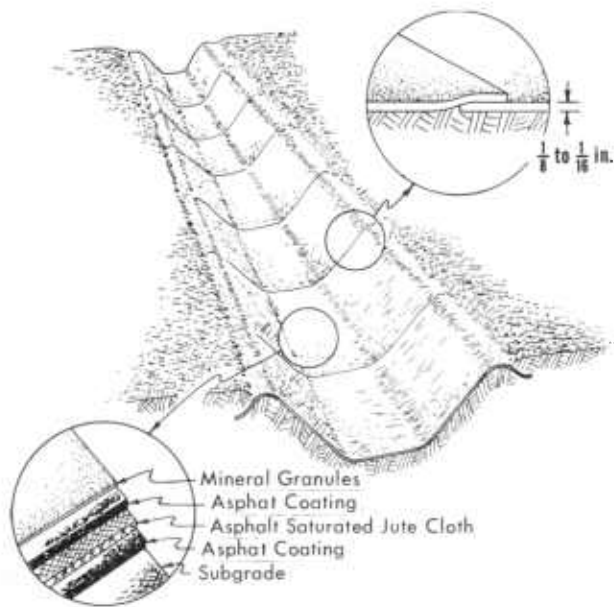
Sheet of plank-type prefabricated asphaltic ditch liner in place.
